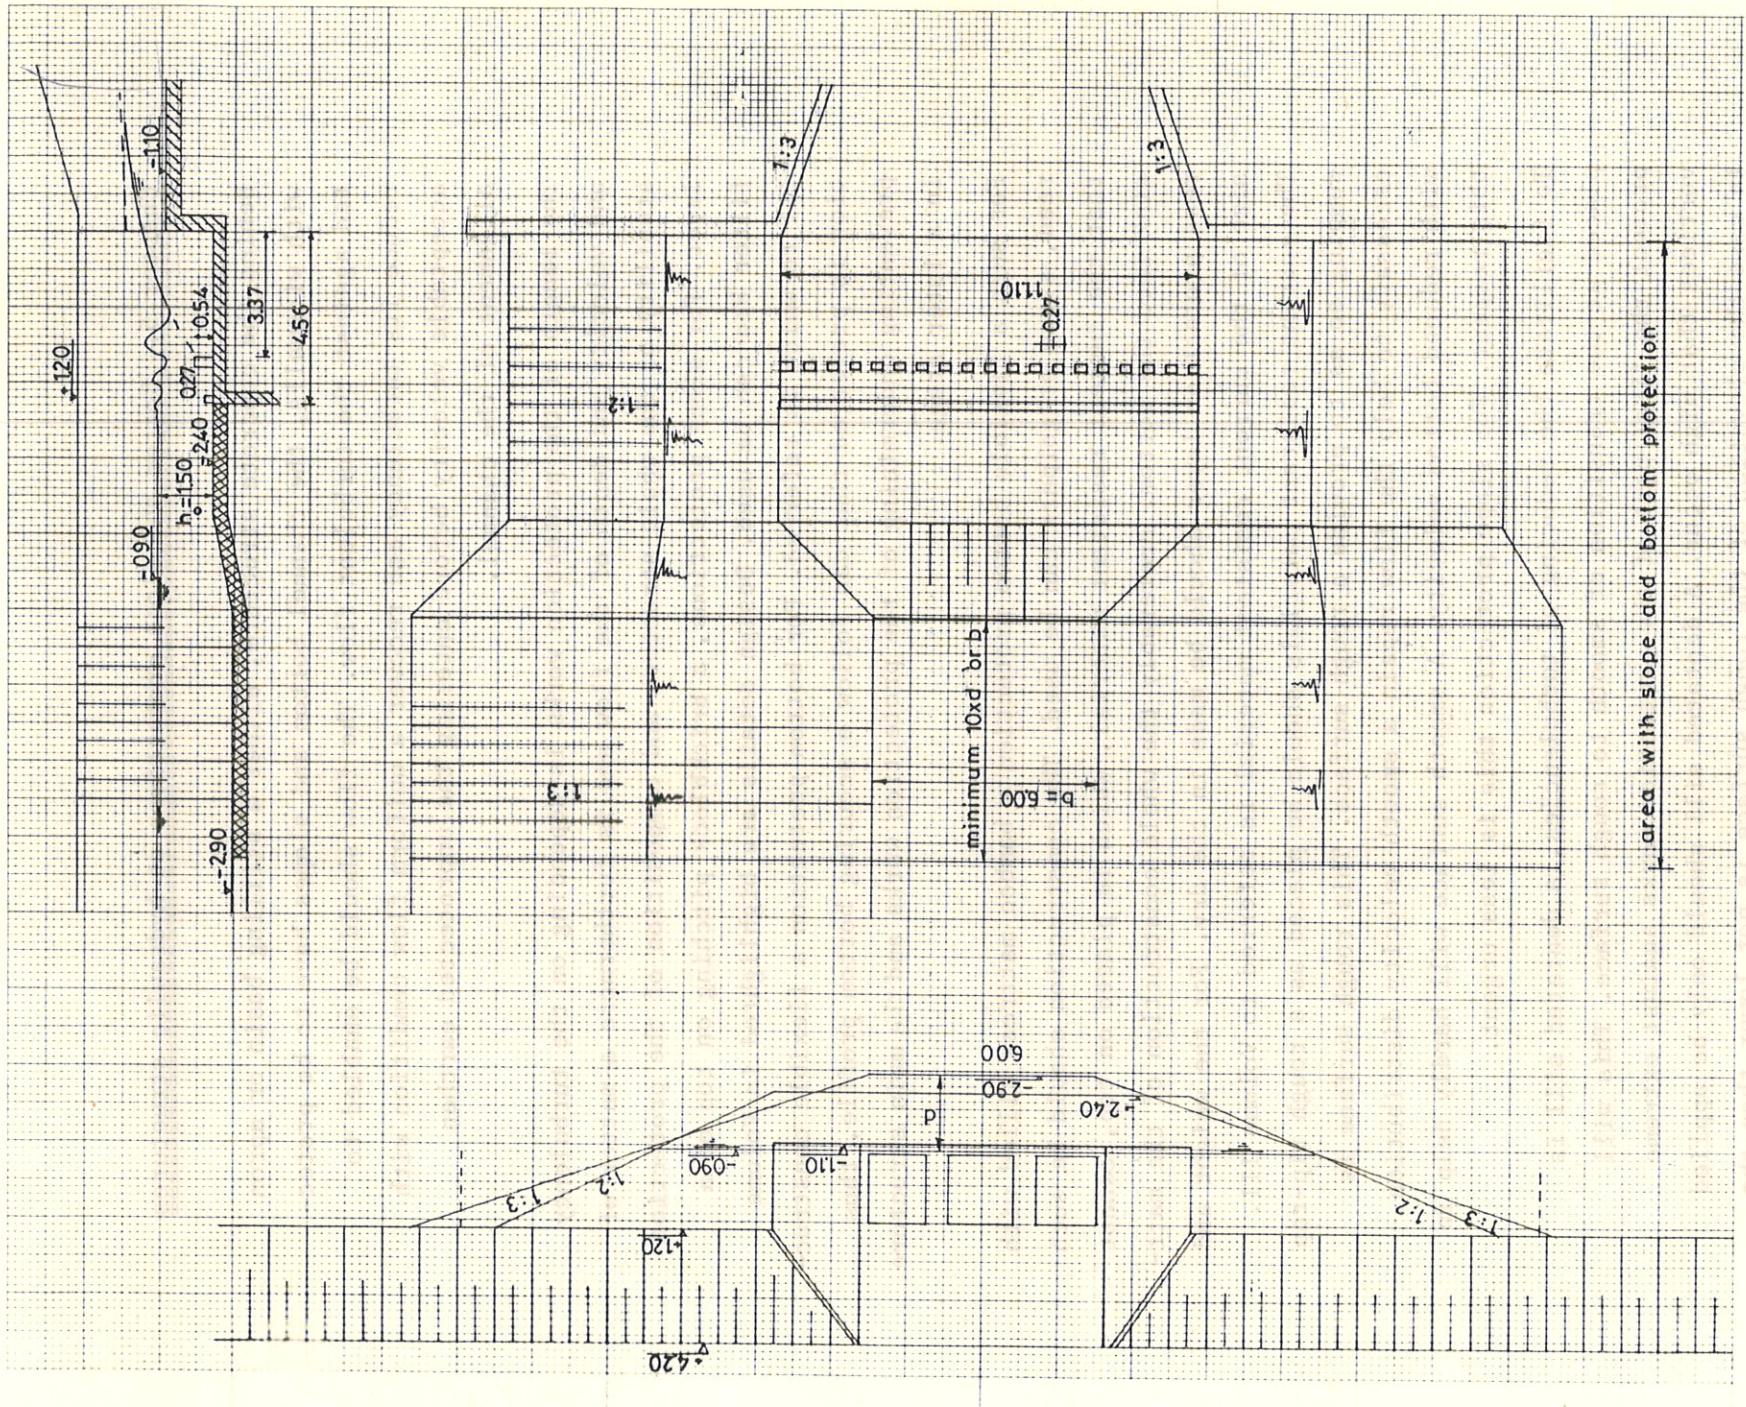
Lay-out of bottom and slope protection for a drainage sluice with apron and depressed baffle block floor.
